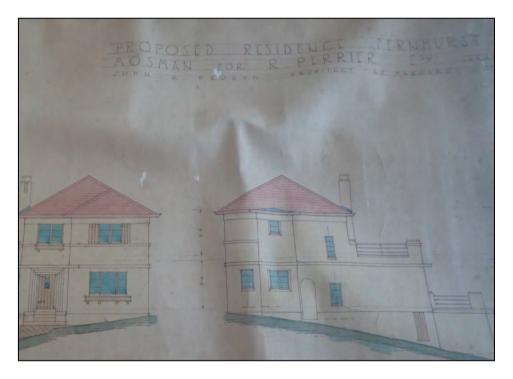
Plans confirming the architect and client associated with the original plans for the dwelling (Photo taken 23 April 2021)
